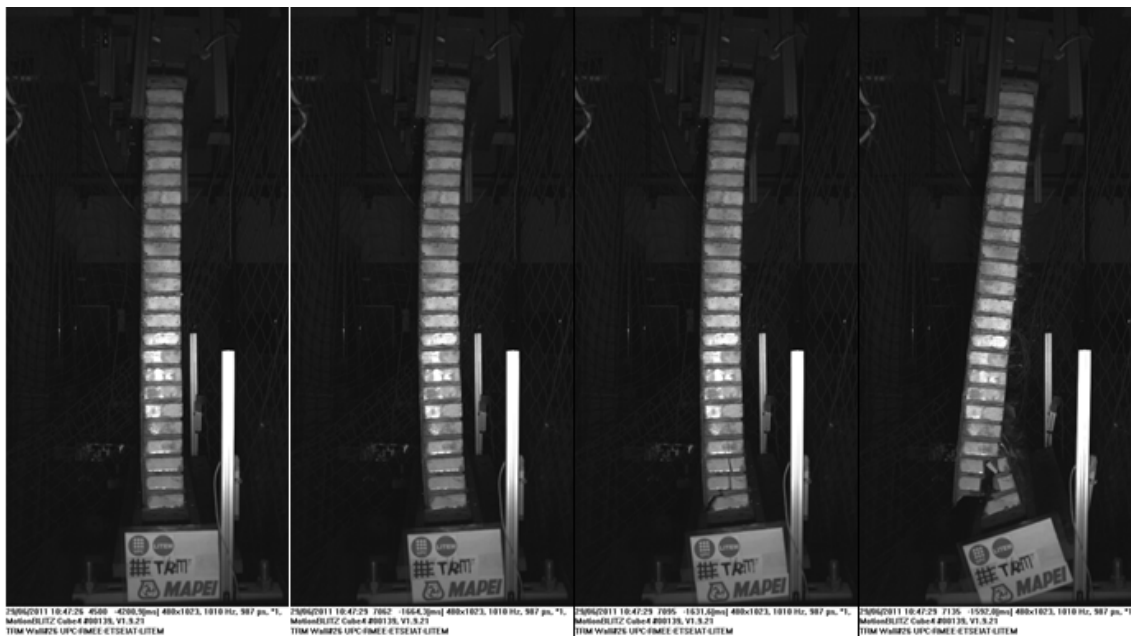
224 Failure of the wall W#26. Masonry failure at wall's bottom.
